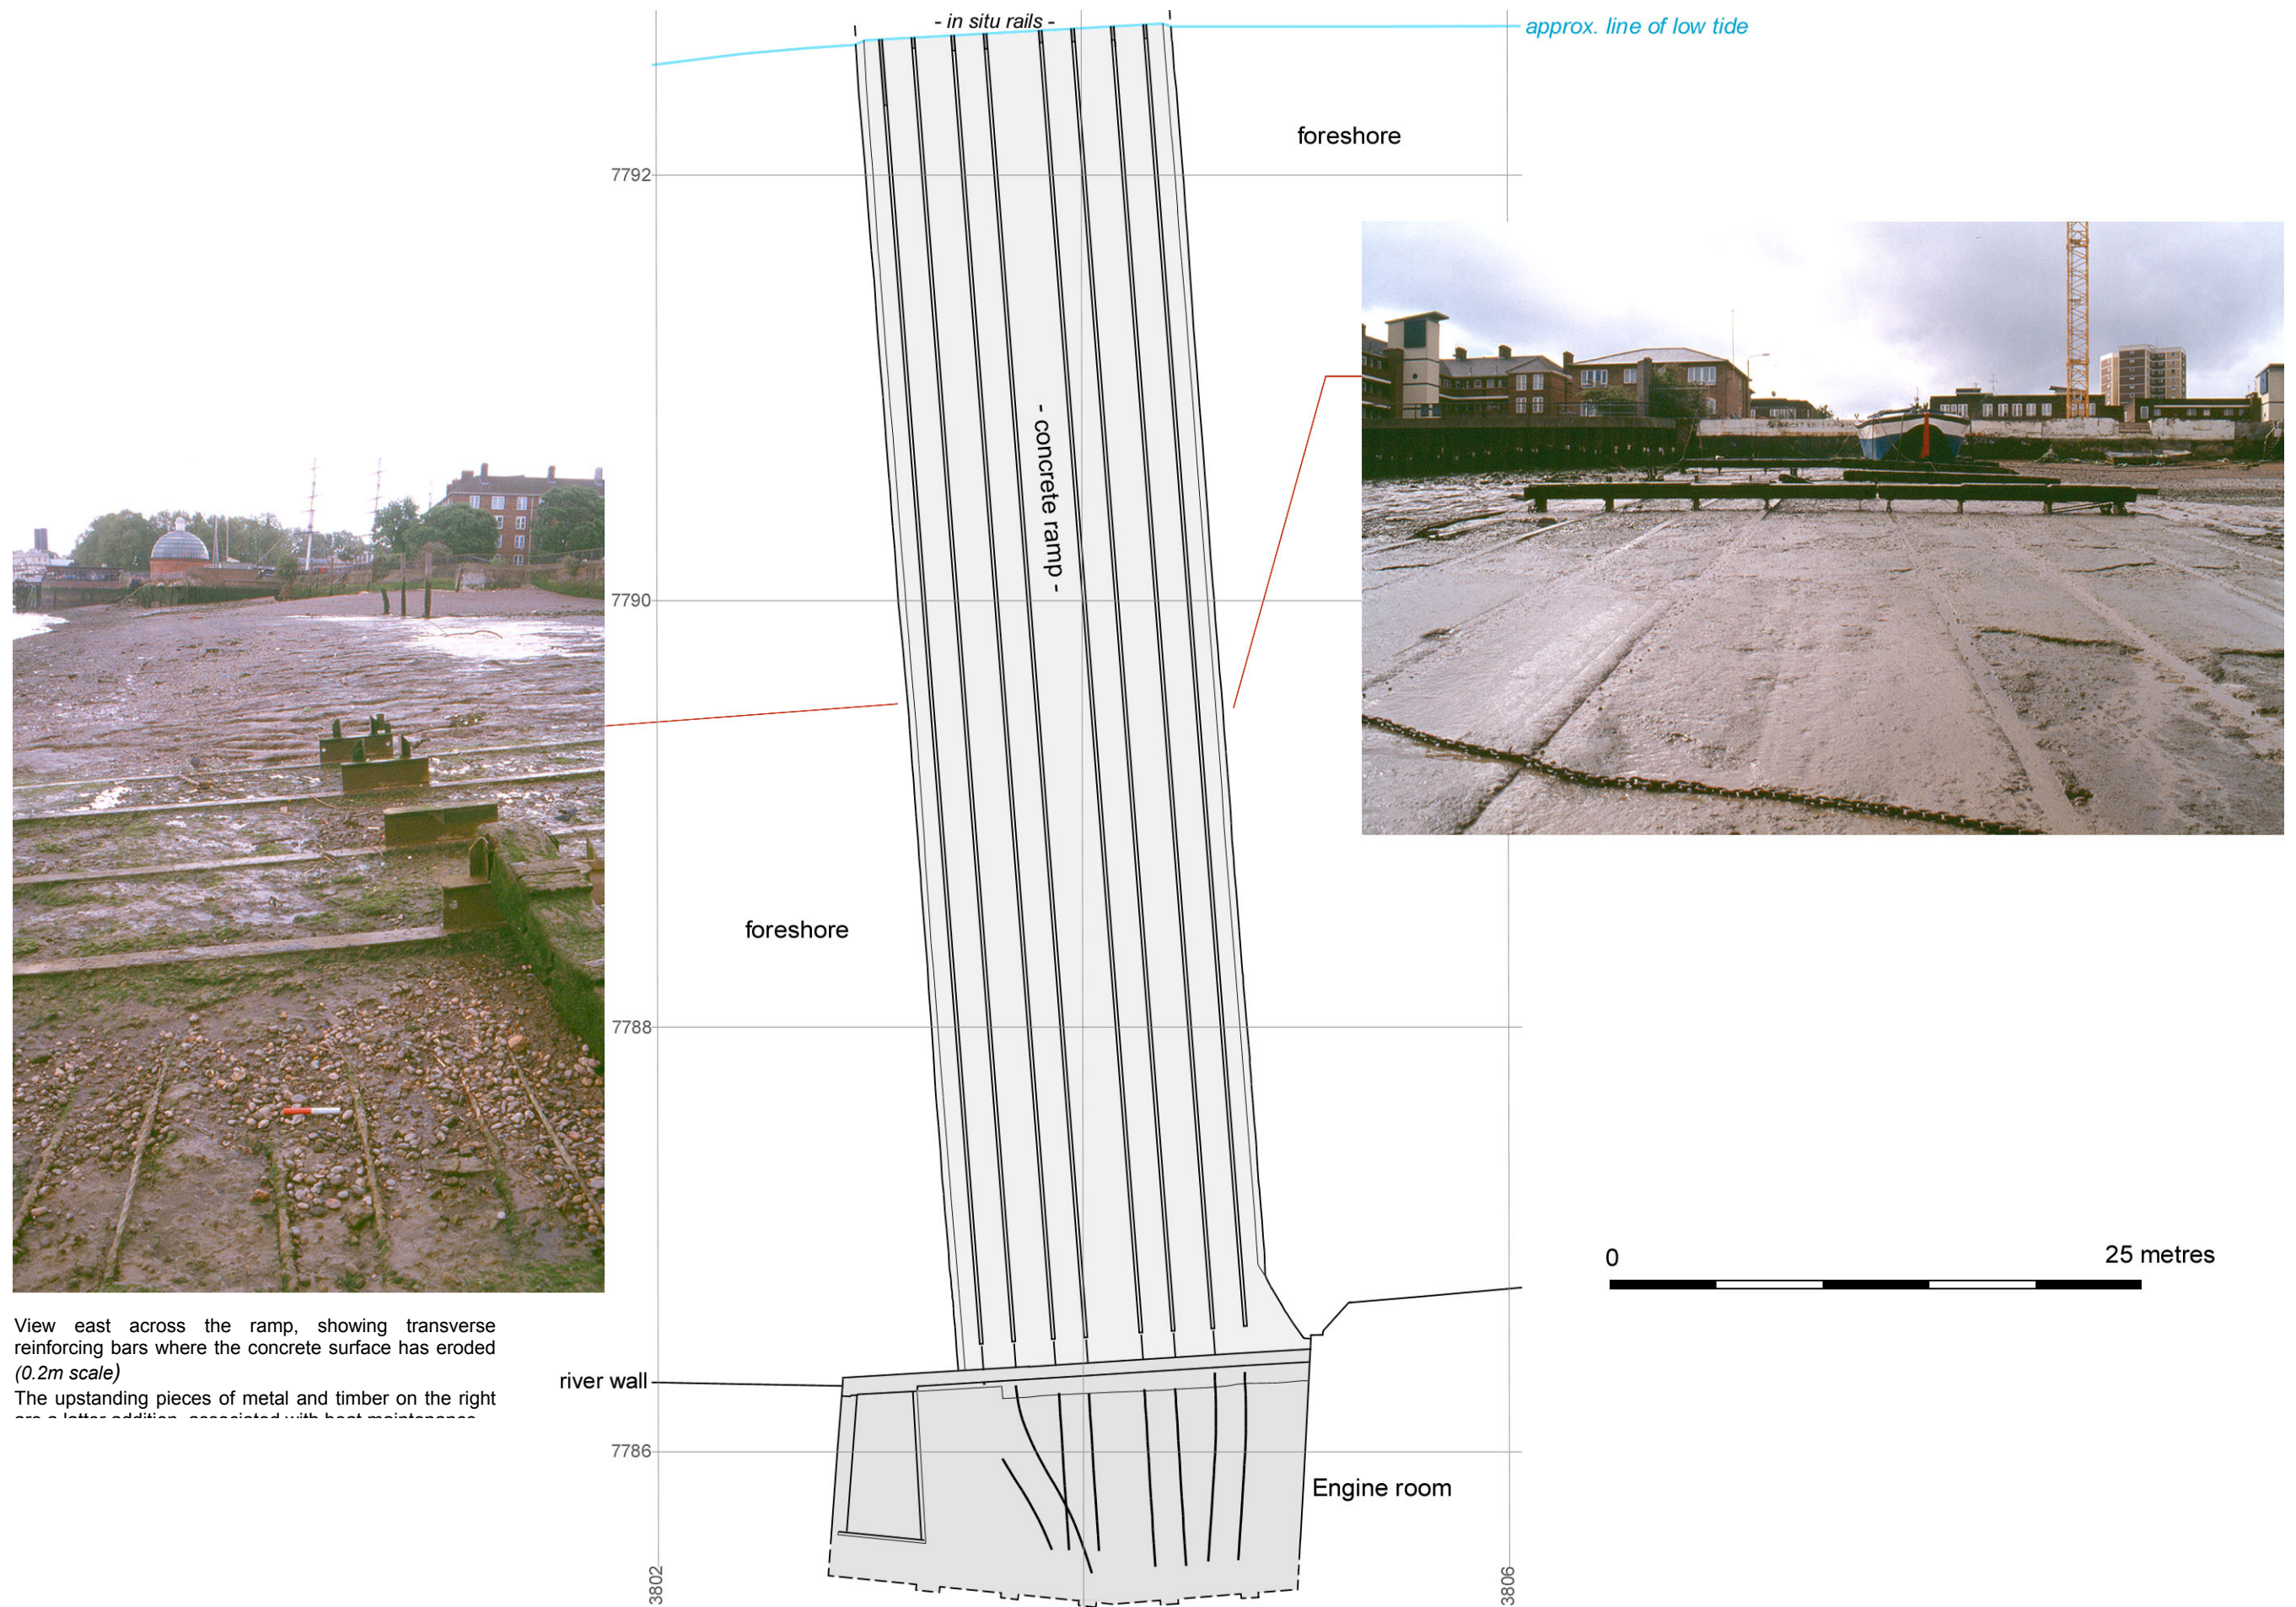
Plan and views of the foreshore ramp. Except at the northern extremity the rails have been removed, but the supporting girders set in concrete survive (see also Fig 31)
